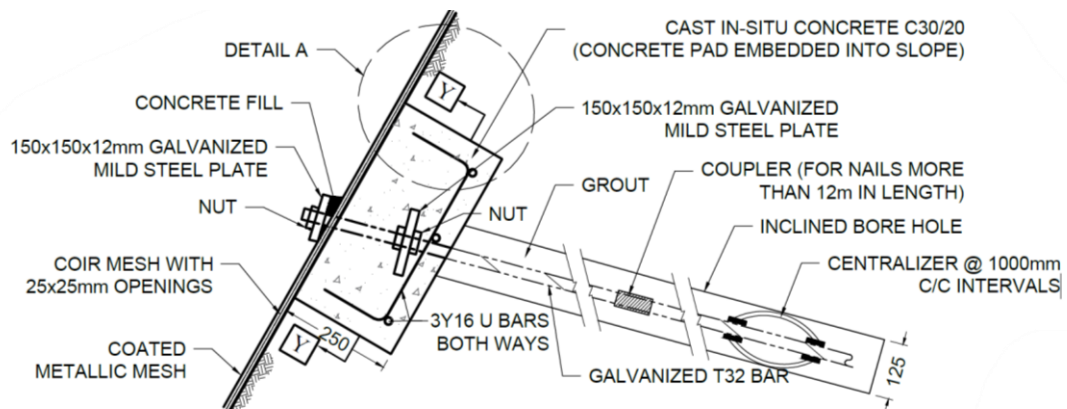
Typical Detail of an Isolated Nailhead (Pillow) (NBRO Design Documents)
